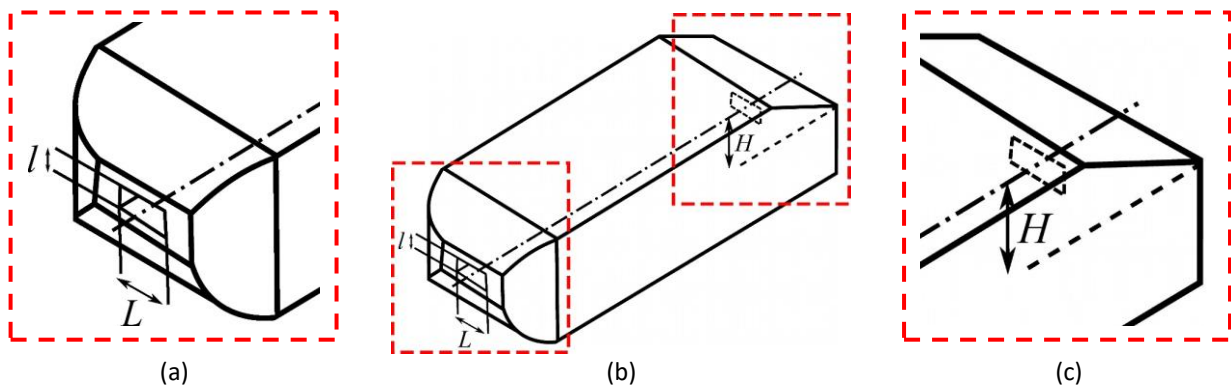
Conduit characteristics (a) Conduit dimensions (b) Overall view (c) Conduit placement
